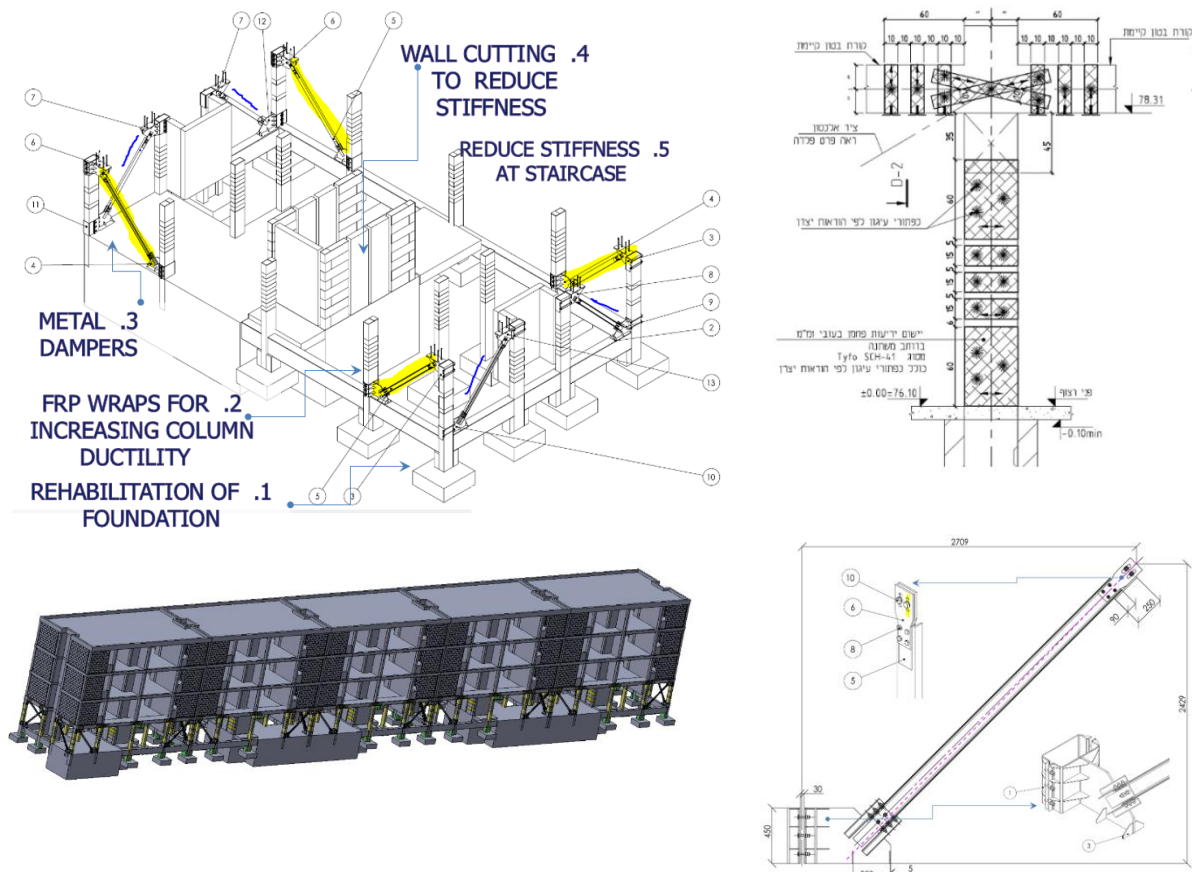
Retrofit measures, clockwise from top left: Retrofit scheme sketch, FRP jacketing of concrete columns, isometric view of 3D model, and steel brace details.
